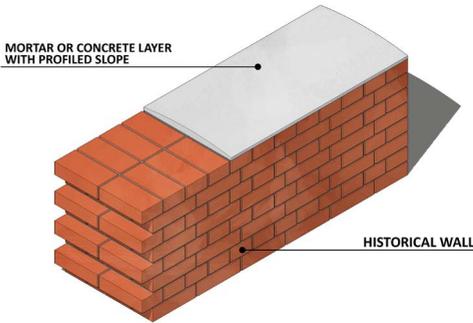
Scheme for the protection of the cope of a brick wall with mortar or concrete
